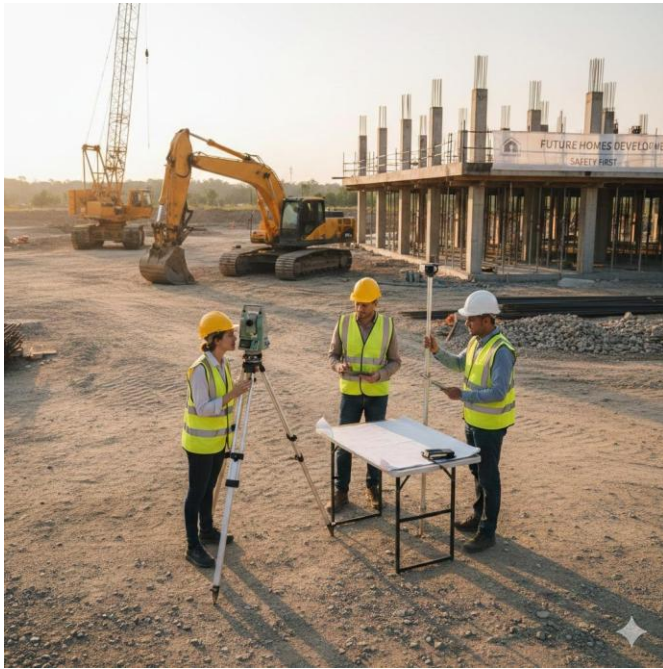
Engineers conducting an engineering survey at a construction site.
